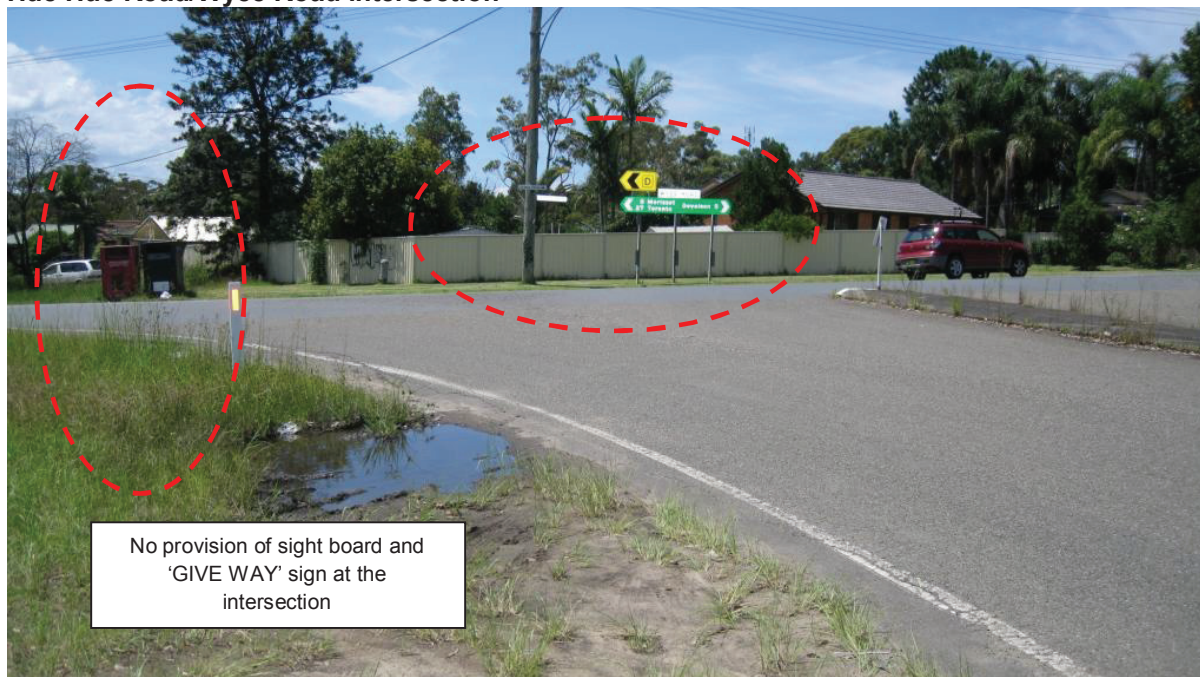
Hue Hue Road, looking north east towards its intersection with Wyee Road
